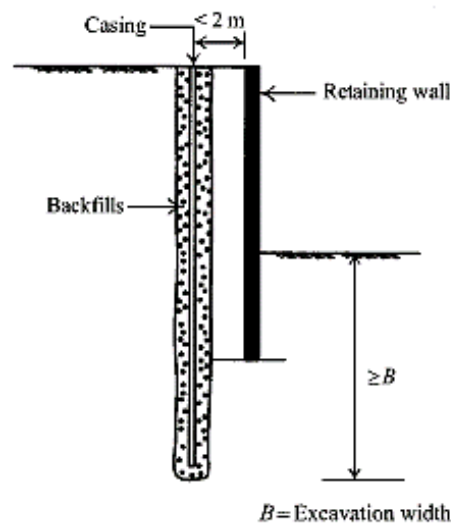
Schematic illustration of an inclinometer behind a retaining wall. After (Ou 2006).
